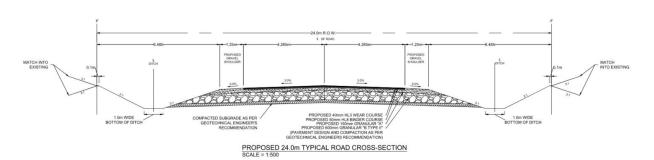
Typical 24.0 m Industrial Roadway Cross-Section
